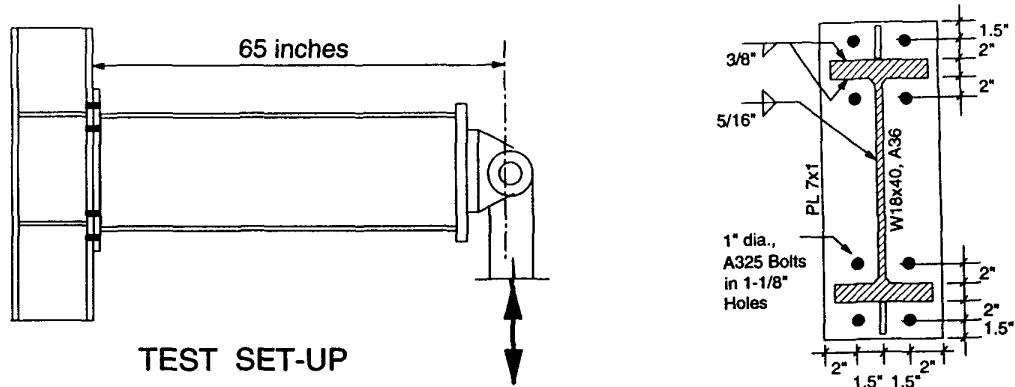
Test Set-up and Connection Detail Used in Cyclic Tests of End Plate Moment Connections (Astaneh-Asl, 1986c)
